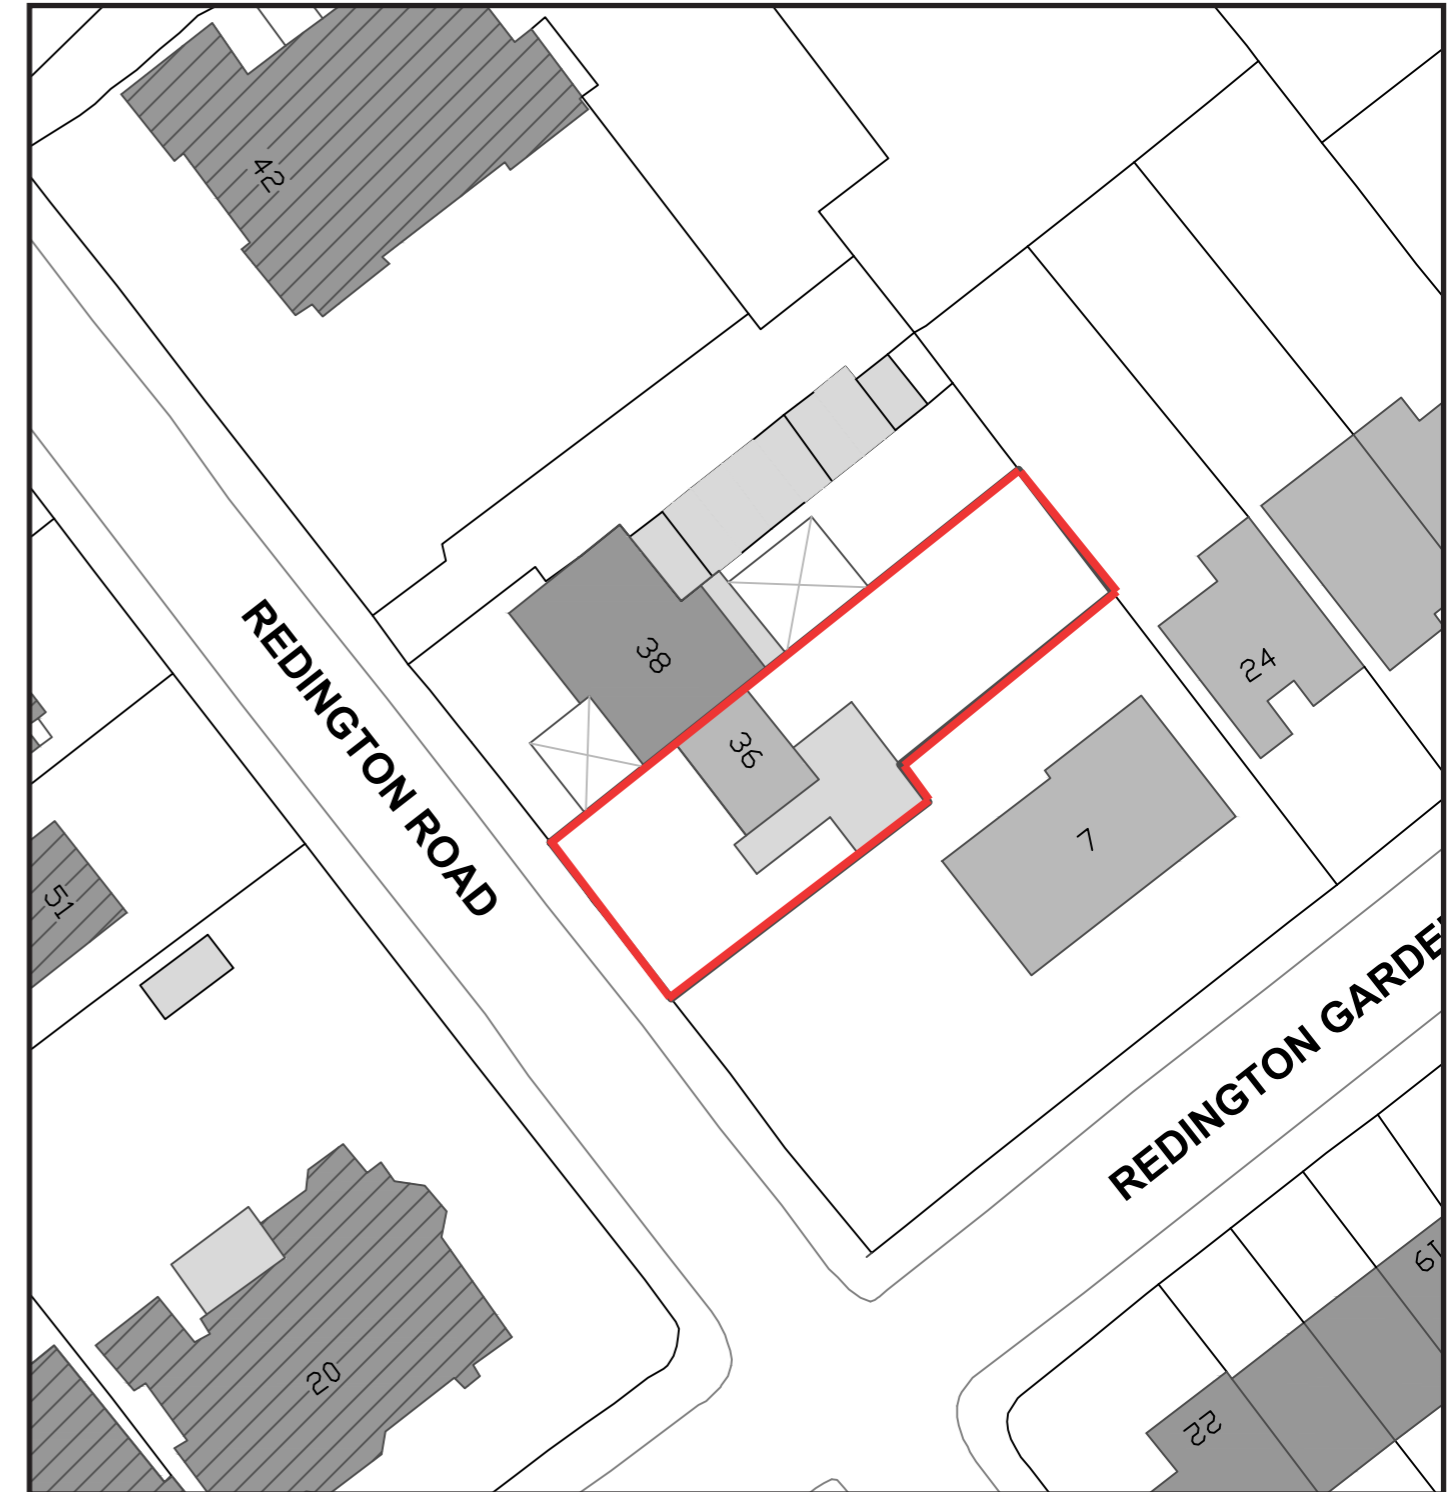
1:500 Location Plan (proposal site outlined in red)
